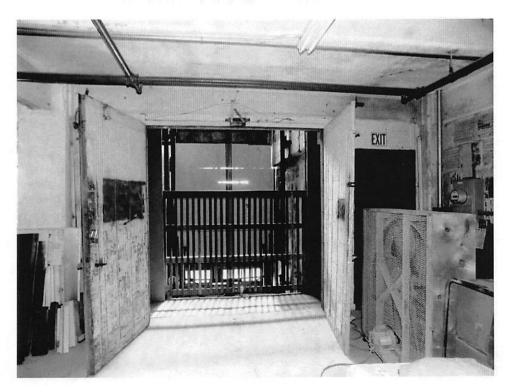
Interior, fourth floor Unit A, elevator and fire shutter doors, looking east.
